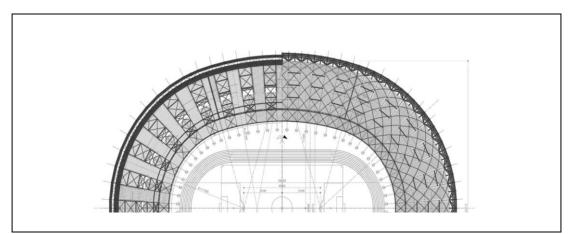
Partial Plan (Ingenta Connect, 2021)
